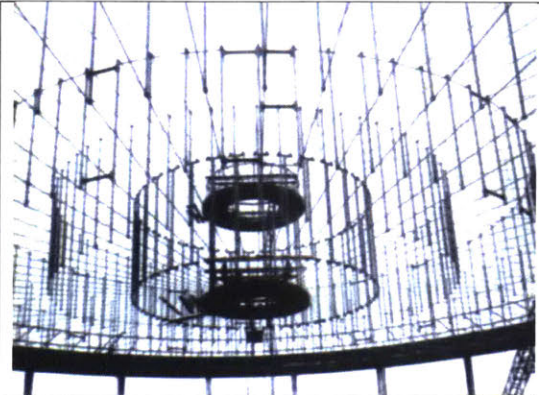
Roof Structure of the Madison Square Garden (Building with steel, 1968)
